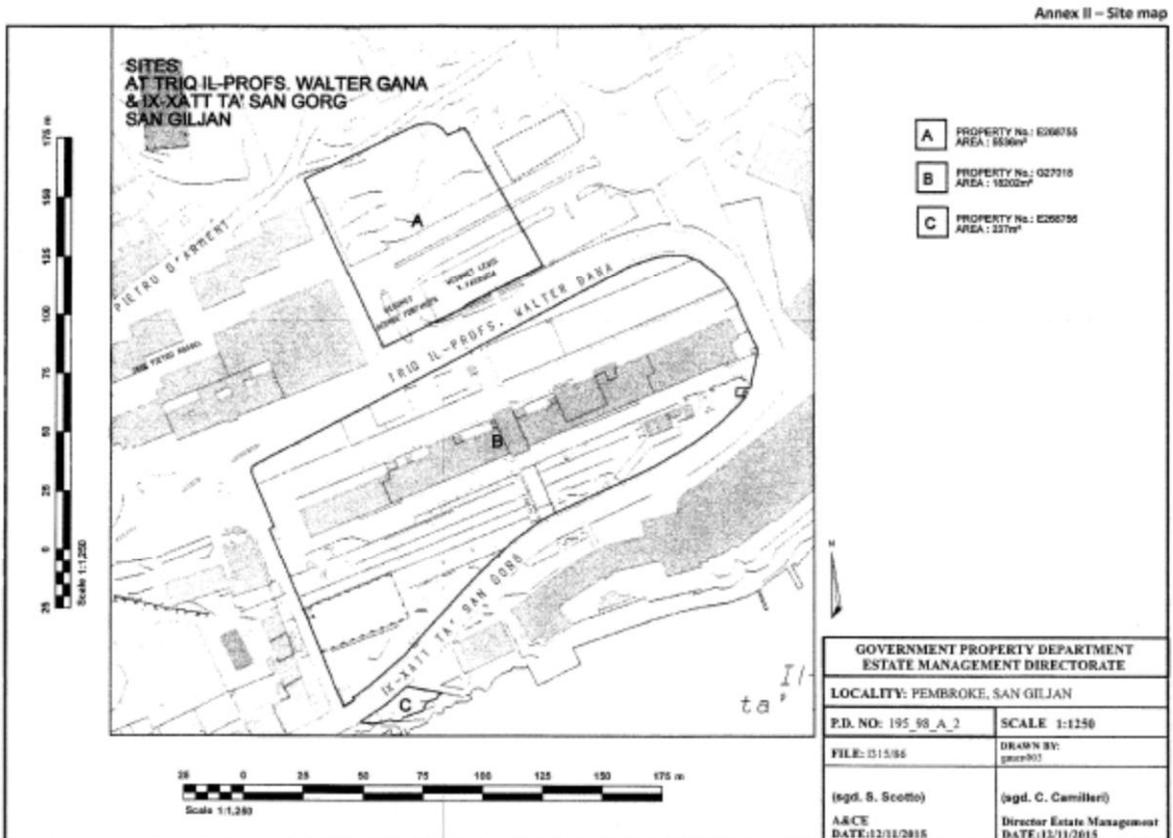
Plan showing the site breakdown – Site A: Parking area, Site B: Residential tower, shopping complex, hotel, and other amenities, Site C: Temporary lido (Source: PDS)
